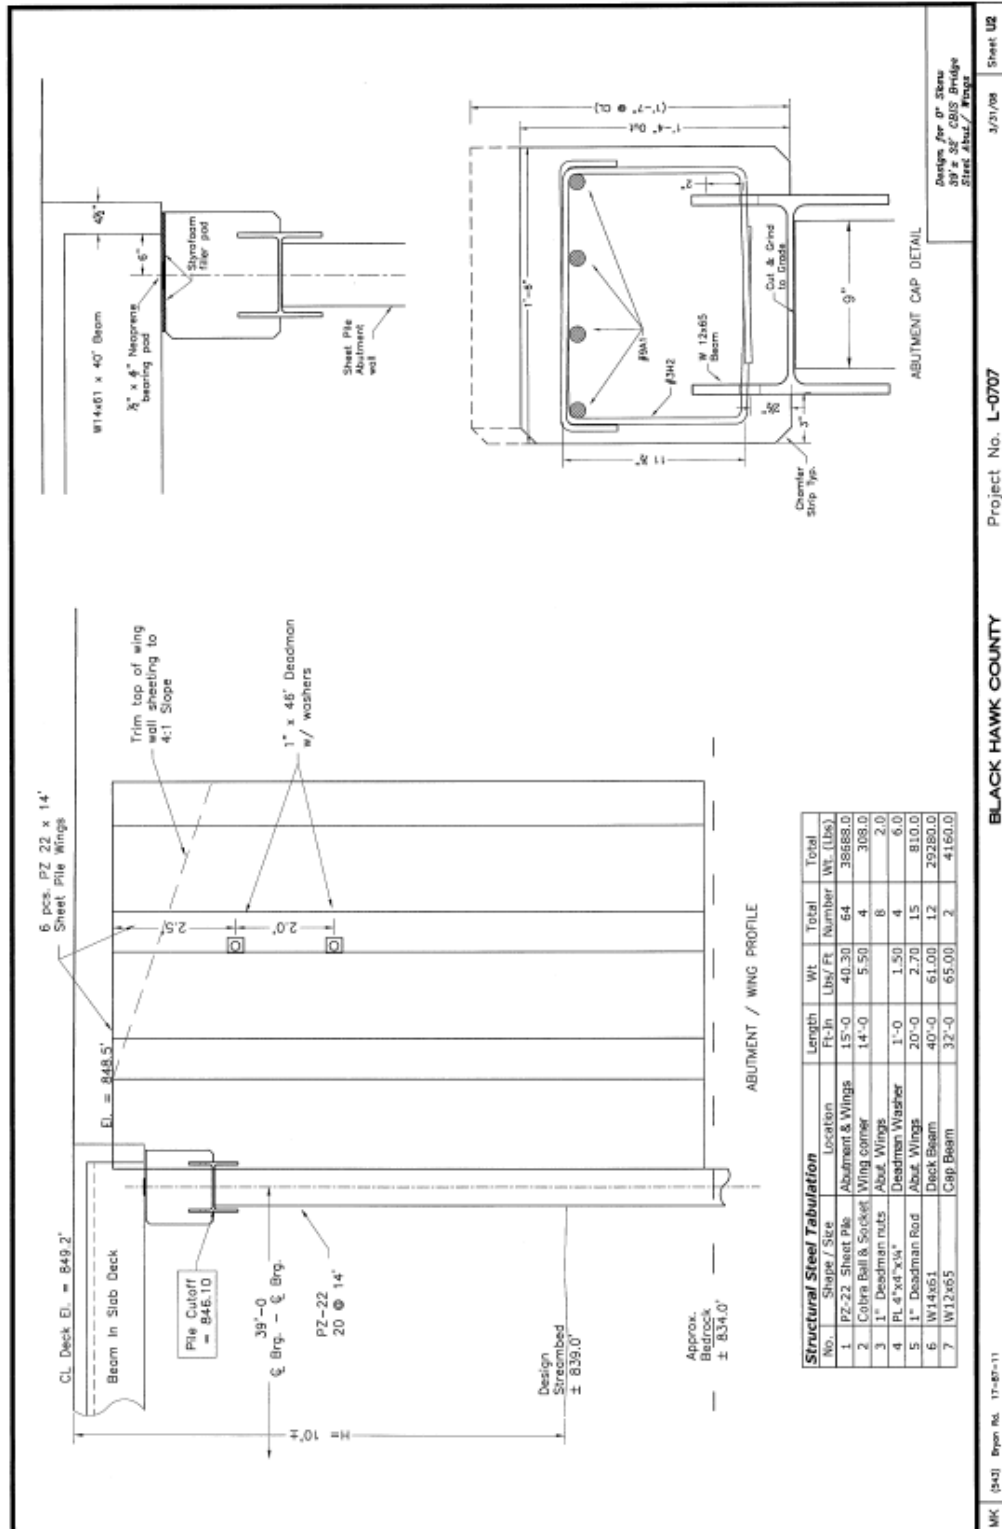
Abutment profile and cap detail of sheet pile abutment and backfill retaining system for demonstration project in BHC, Iowa
